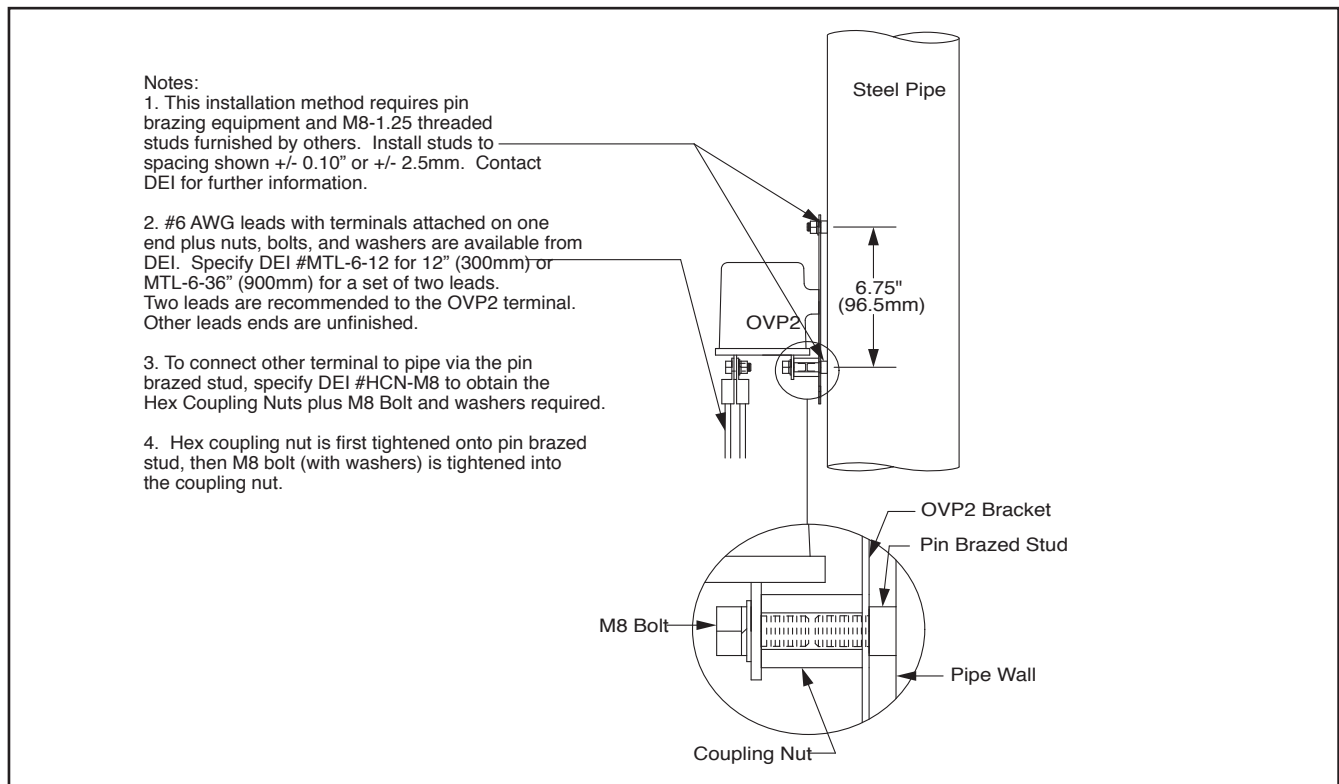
Flange Mount Using Tapped Holes or Pin Brazed Studs
